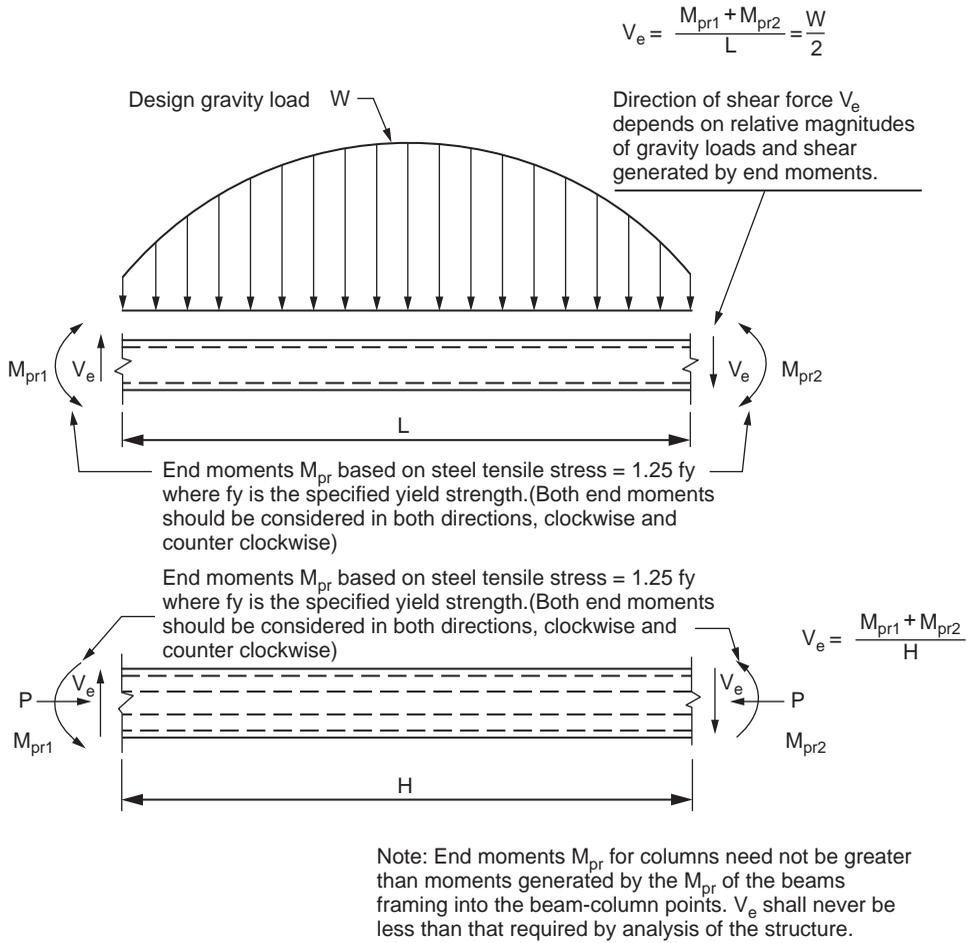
Design shears for girders and columns. (Source: ACI 318, 1992.)
